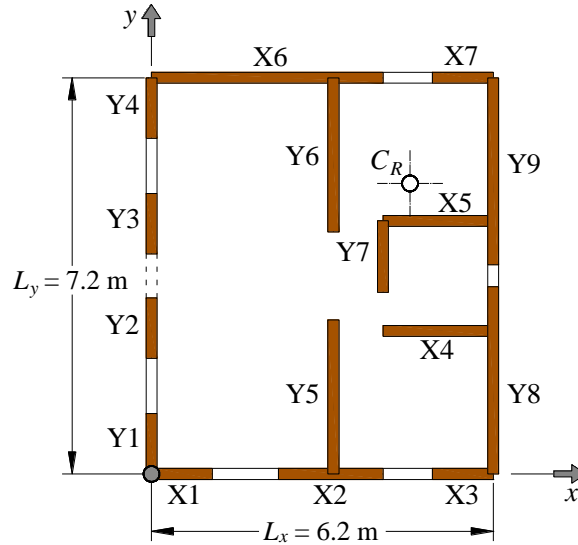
Sketch of MWFRS wall layout, dashed lines indicates main entrance and a continuous line indicates windows.
